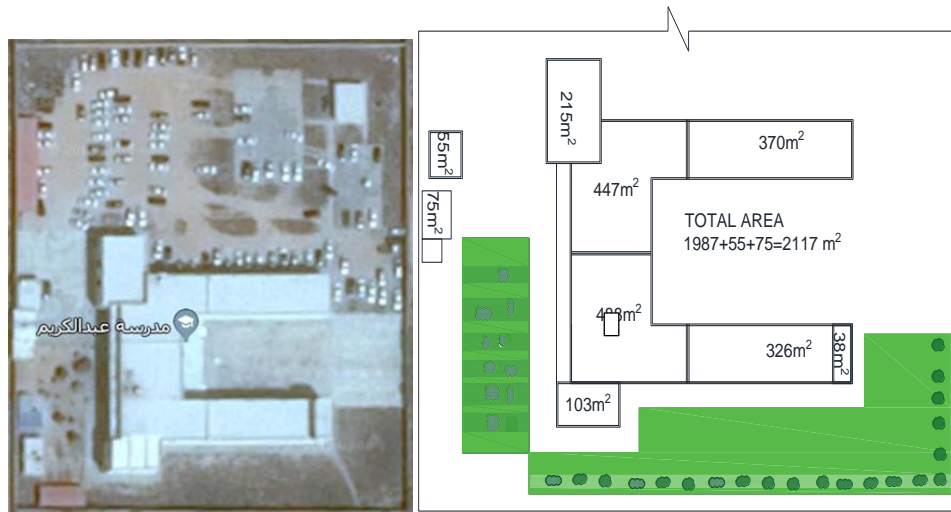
Garaboulli Engineering Building, Plan (left) and air photo (right)
